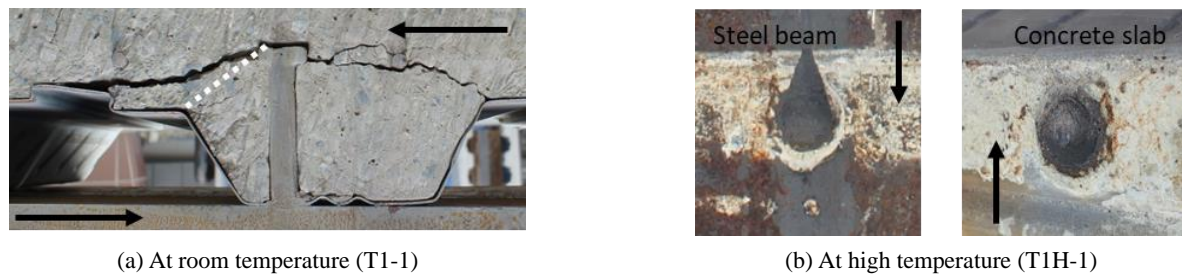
Failure mode of the trapezoidal deck specimens with through-deck welding
